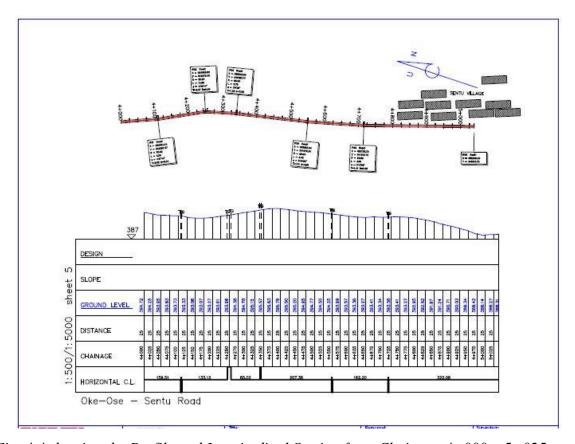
showing the Profile and Longitudinal Section from Chainage 4+000-5+025
